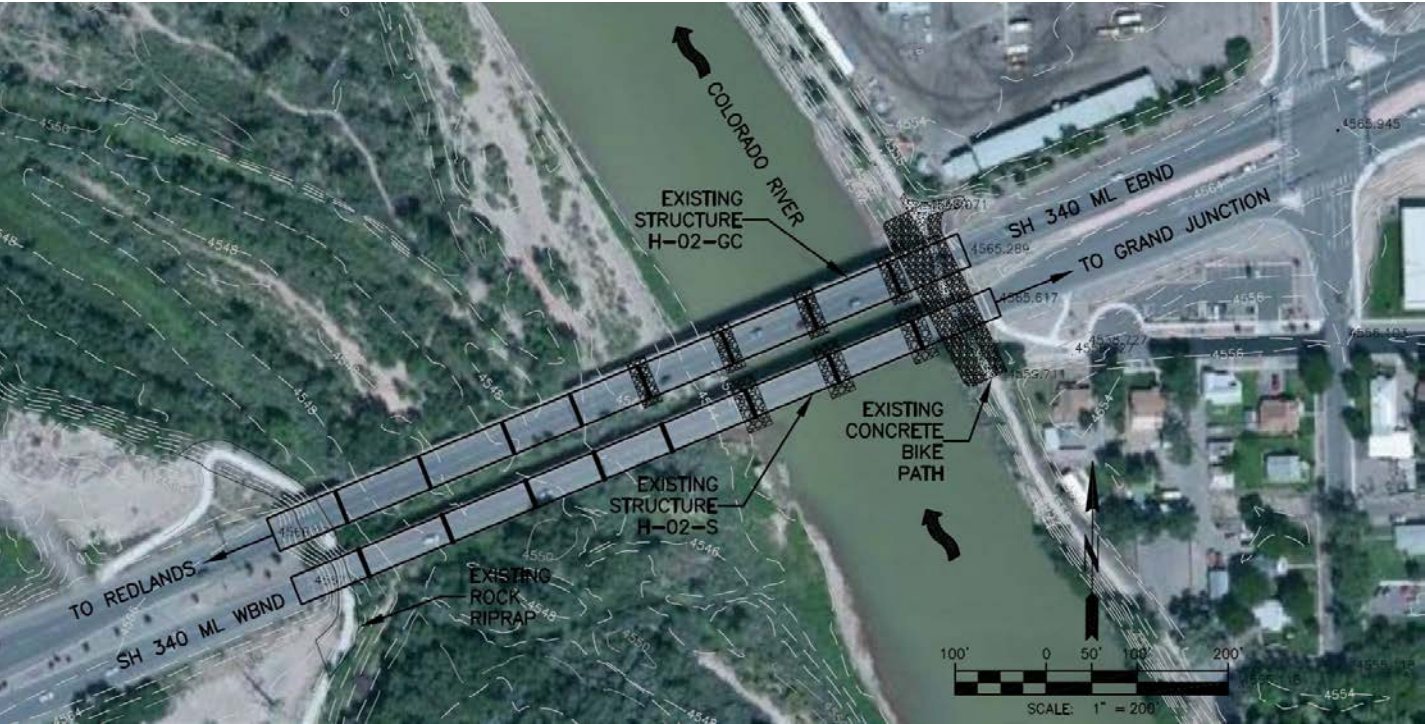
Plan view of Bridges H-02-GC and H-02-S with recommended hydraulic scour countermeasure locations
